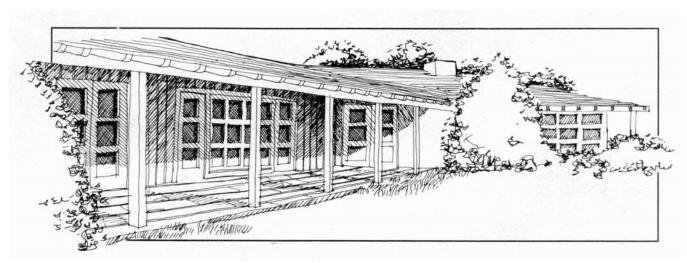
The Ranch house was one of the first architectural styles to provide an extension of the indoor space to the outside through the use of large picture windows, covered porches and patios.
